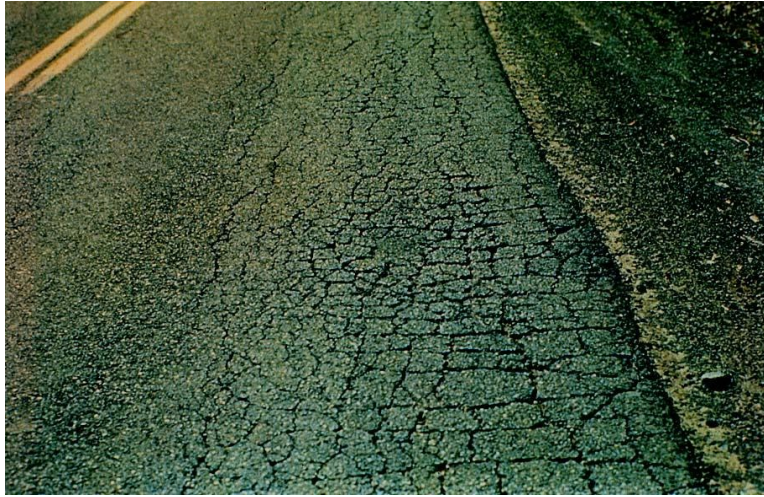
Severely fatigued cracked pavement [12]
